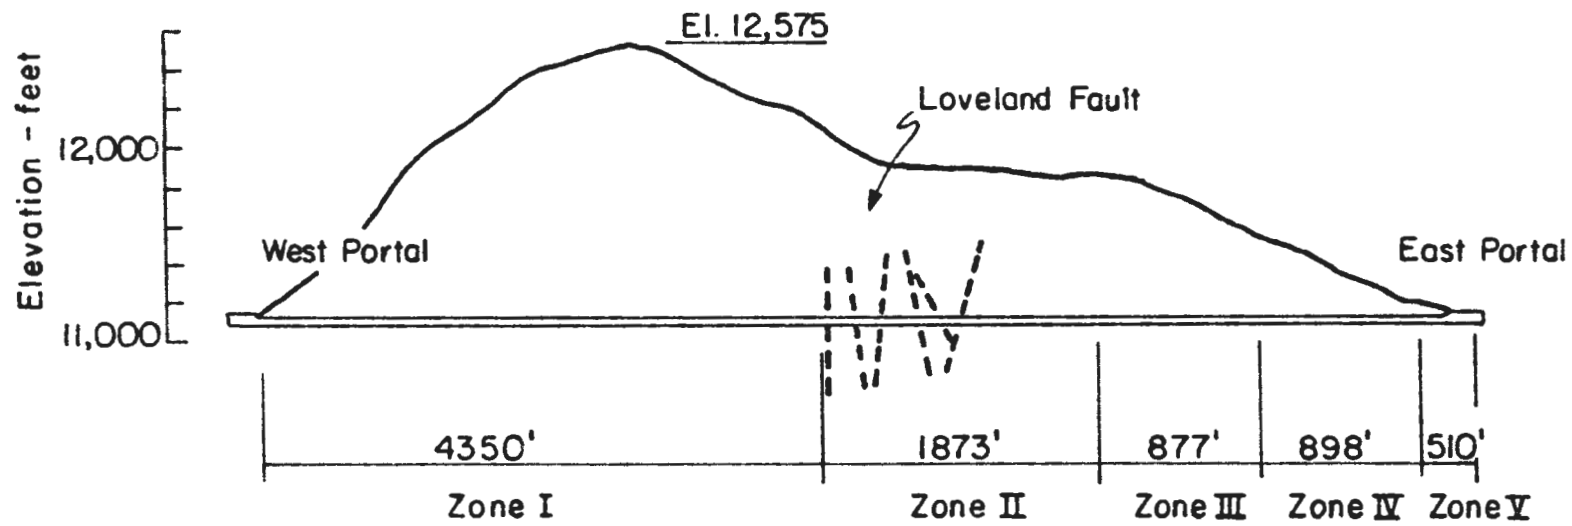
SECTION OF EISENHOWER TUNNEL. (after Hopper et. al., 1972)
